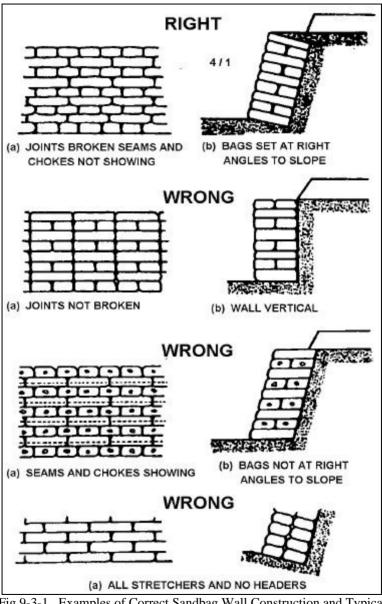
Examples of Correct Sandbag Wall Construction and Typical Mcistakes
